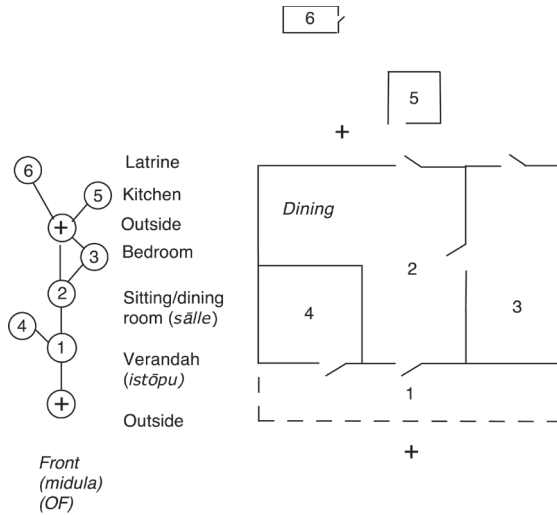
B. Floor plan of typical Walangama pil gē.
